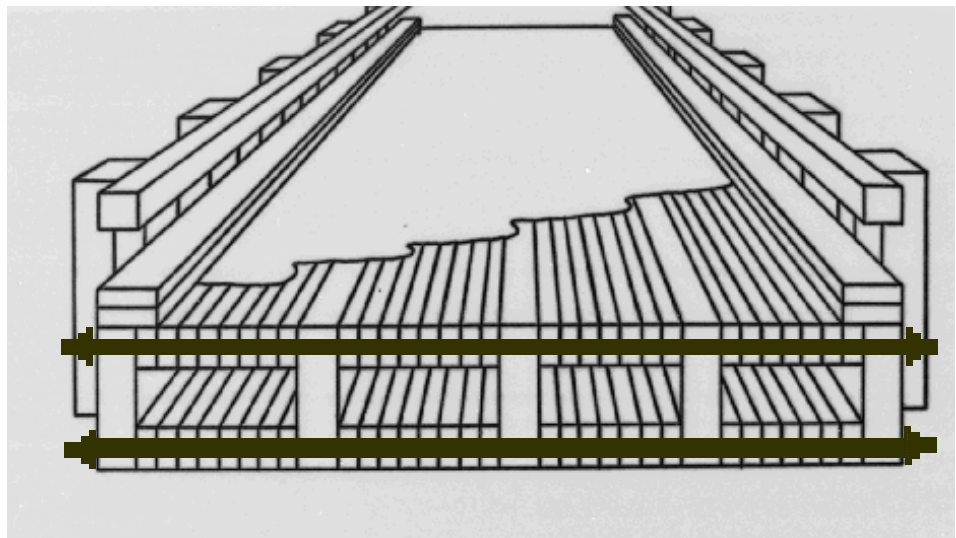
Typical Section of a Stress-Laminated Timber Box Beam (Source: Barry Dickson, West Virginia University)
